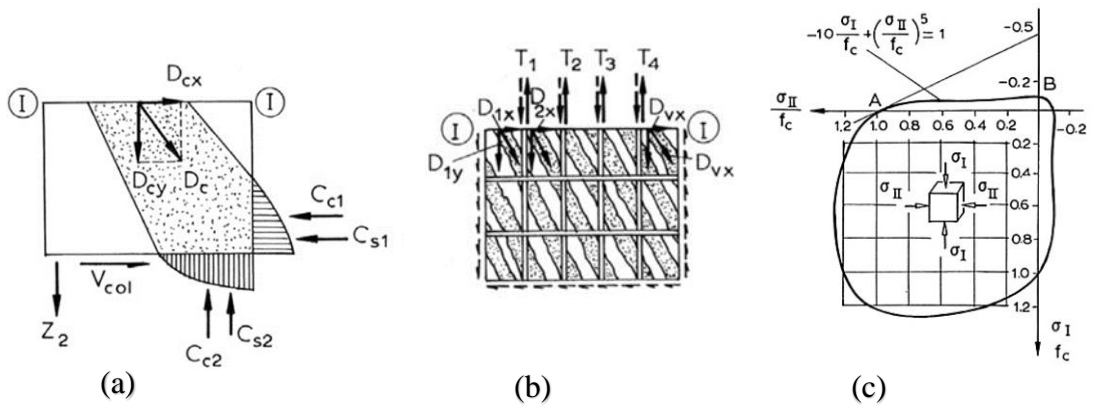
(a) Concrete strut mechanism (b) The joint panel truss mechanism (c) Concrete biaxial strength represented by a 5th degree parabola (Tsonos, 2008)
